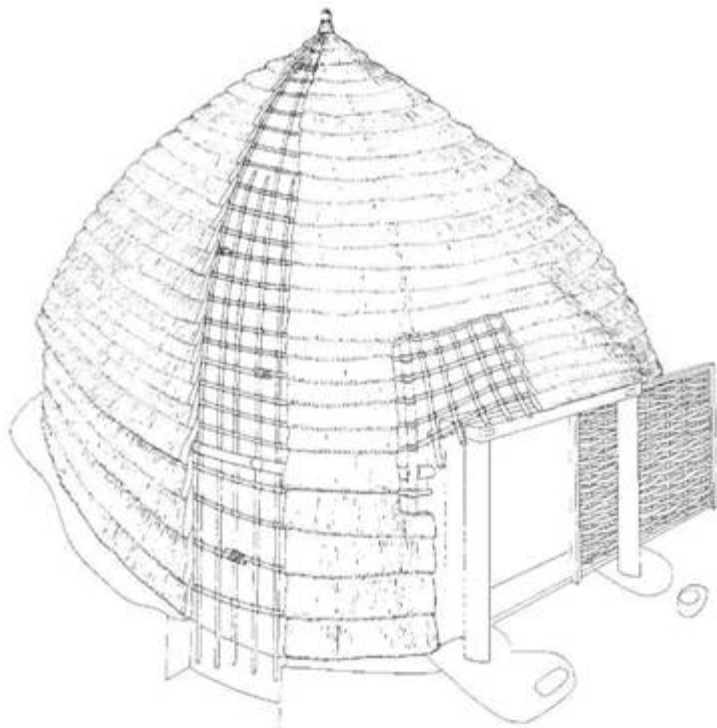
Reconstruction of a stake-built house based on excavated evidence from Danebury, Hants (drawing: Christina Unwin).
